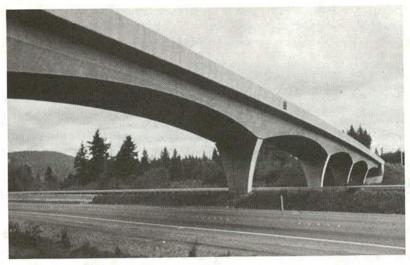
Evergreen Parkway Undercrossing, Washington, a six-span concrete box girder, has both abutments and one pier on spread footings (1).
